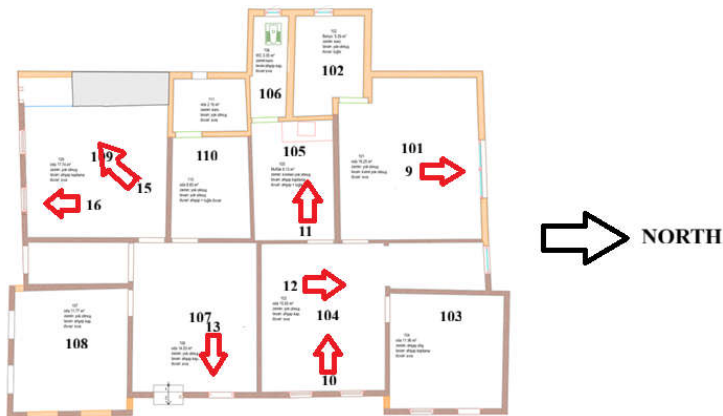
Interior Views of the Second Residence on the South Facade of the Building
